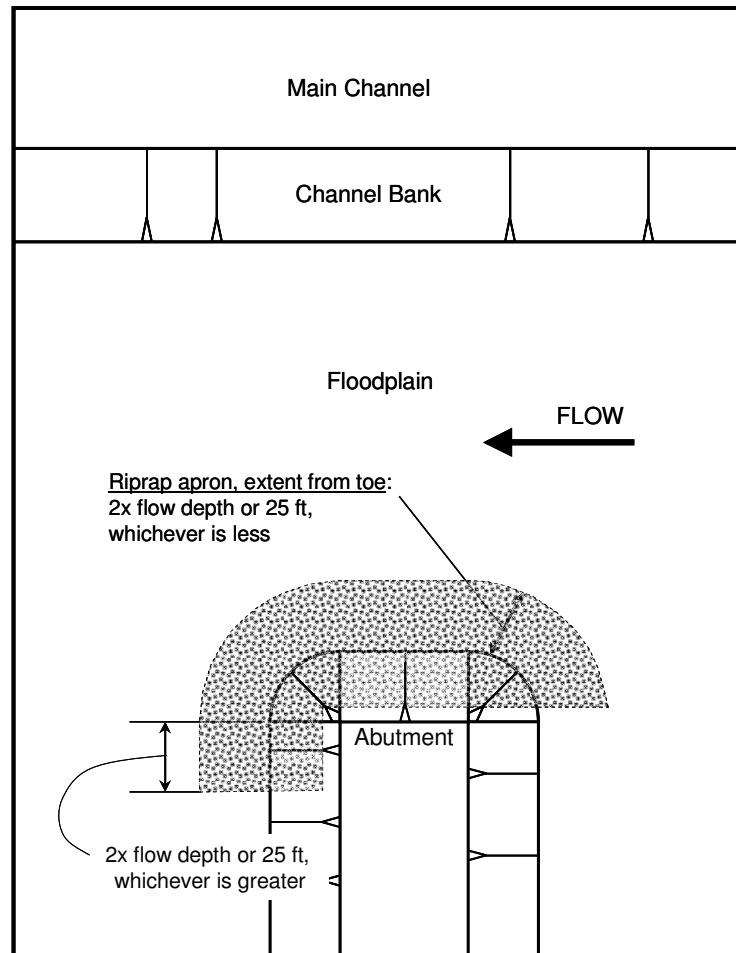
Plan view of the extent of rock riprap apron (Lagasse et al. 2006).
